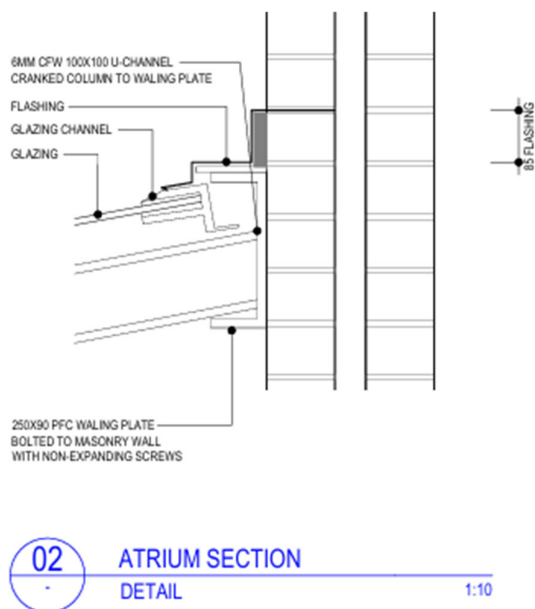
Proposed fixing detail – atrium to brickwork (Studio C+E drawing am 3.03)
